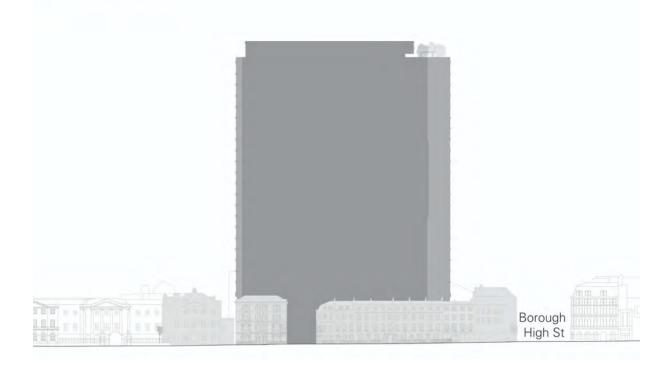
Simplified north elevation showing the relationship between existing terrace and proposed tower
